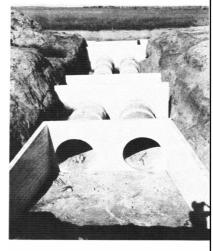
Double-barreled pipe culvert with concrete percolation collars. P-328-701-2021
